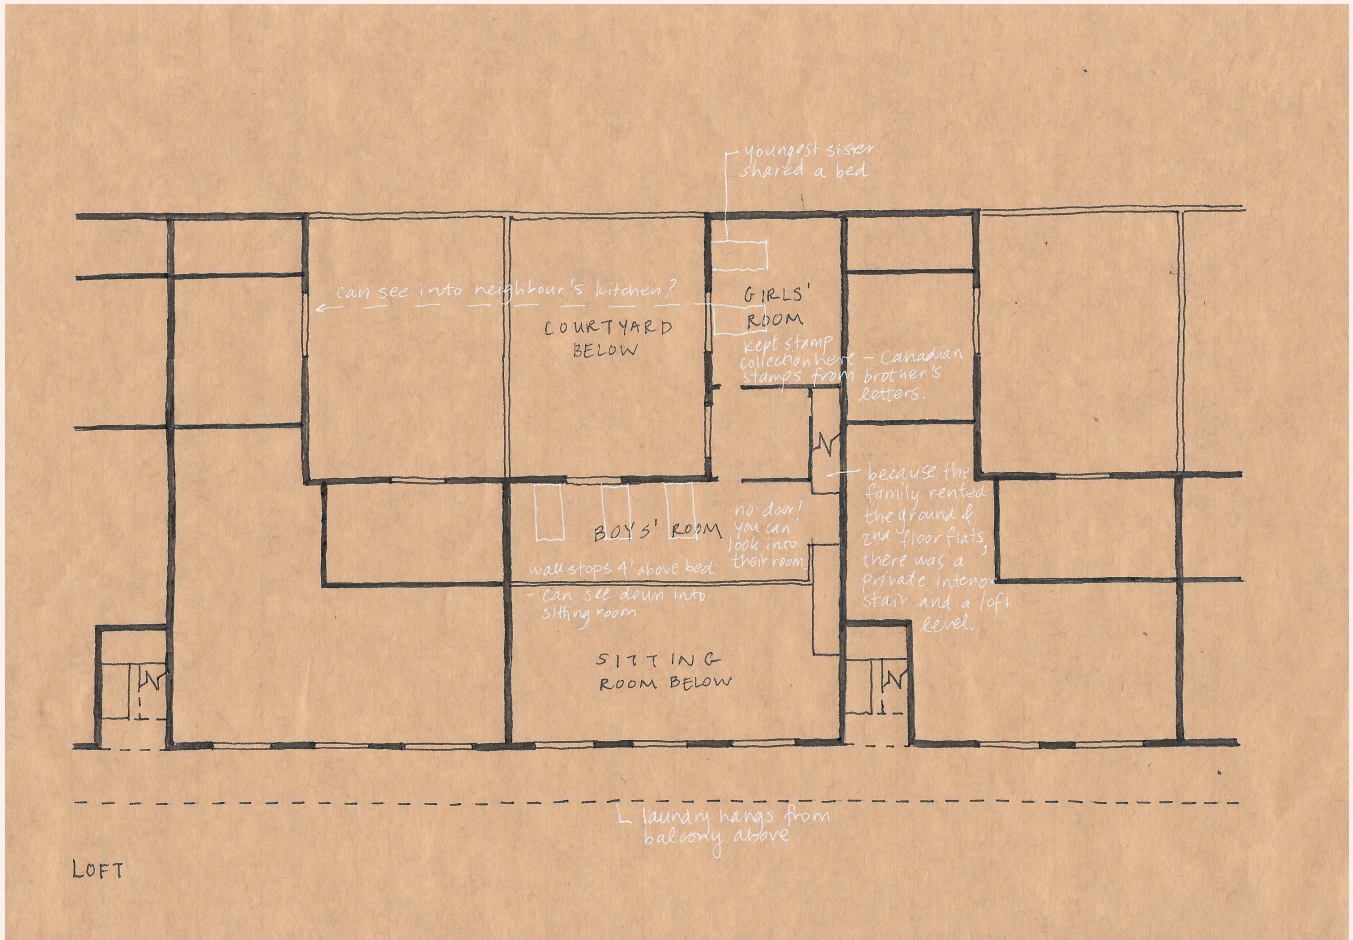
Home in Wan Chai loft floor plan*, image by author.
